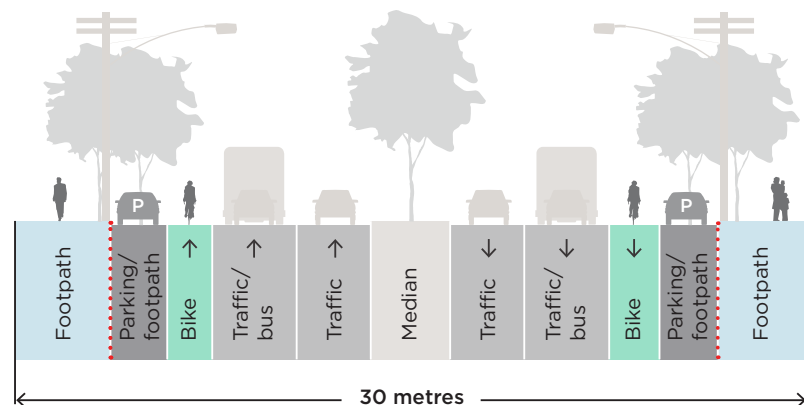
Potential typical street section for Spencer Street in the short term.
